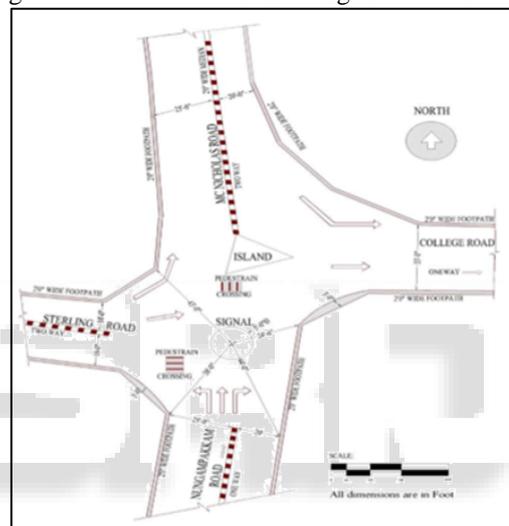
Road inventory and existing traffic flow at sterling road intersection
